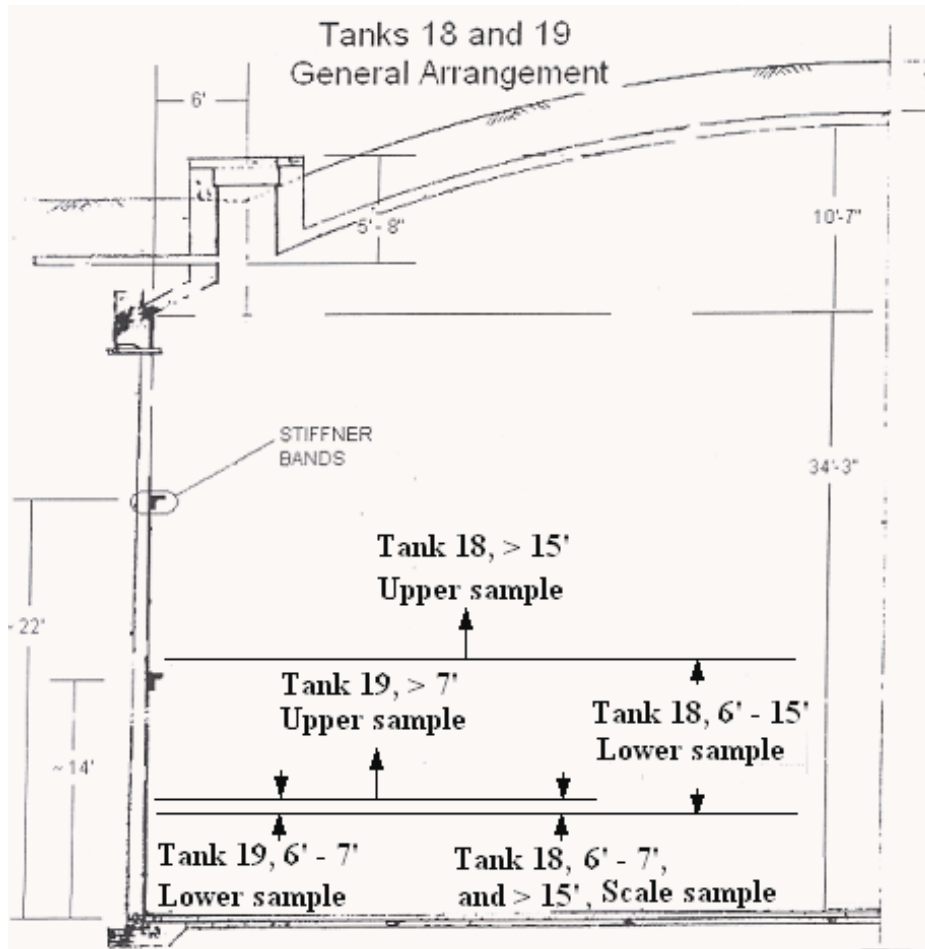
Construction and Elevation View of Mast Installation in Tanks 18 and 19
